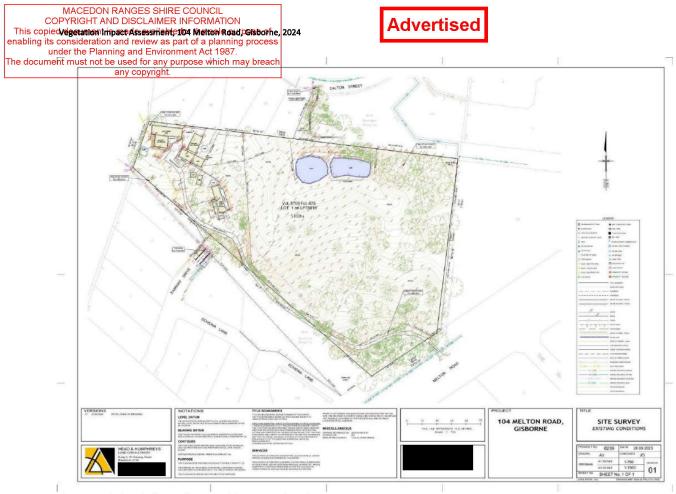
Existing site layout for 104 Gisborne Road, Melton.
